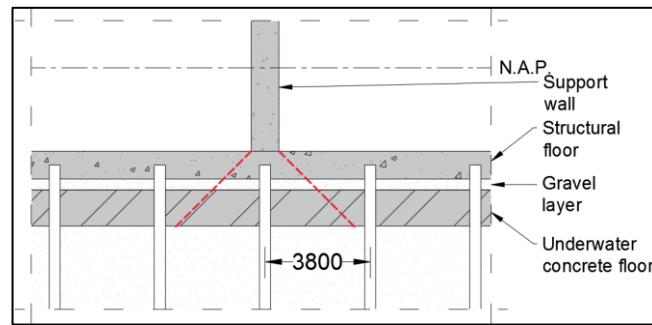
Schematic view of the existing foundation at CPT 1 in cross direction.
